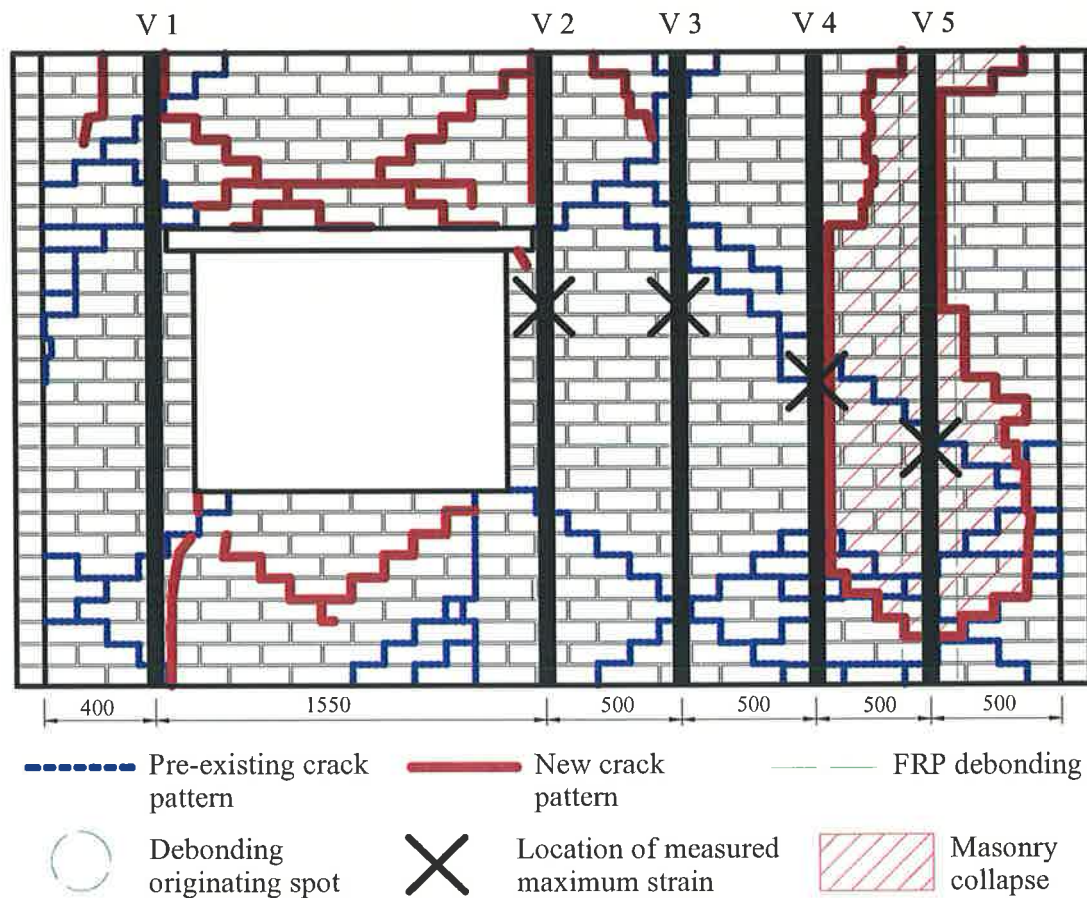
Schematic of cracking pattern and FRP debonding of Wall 3
